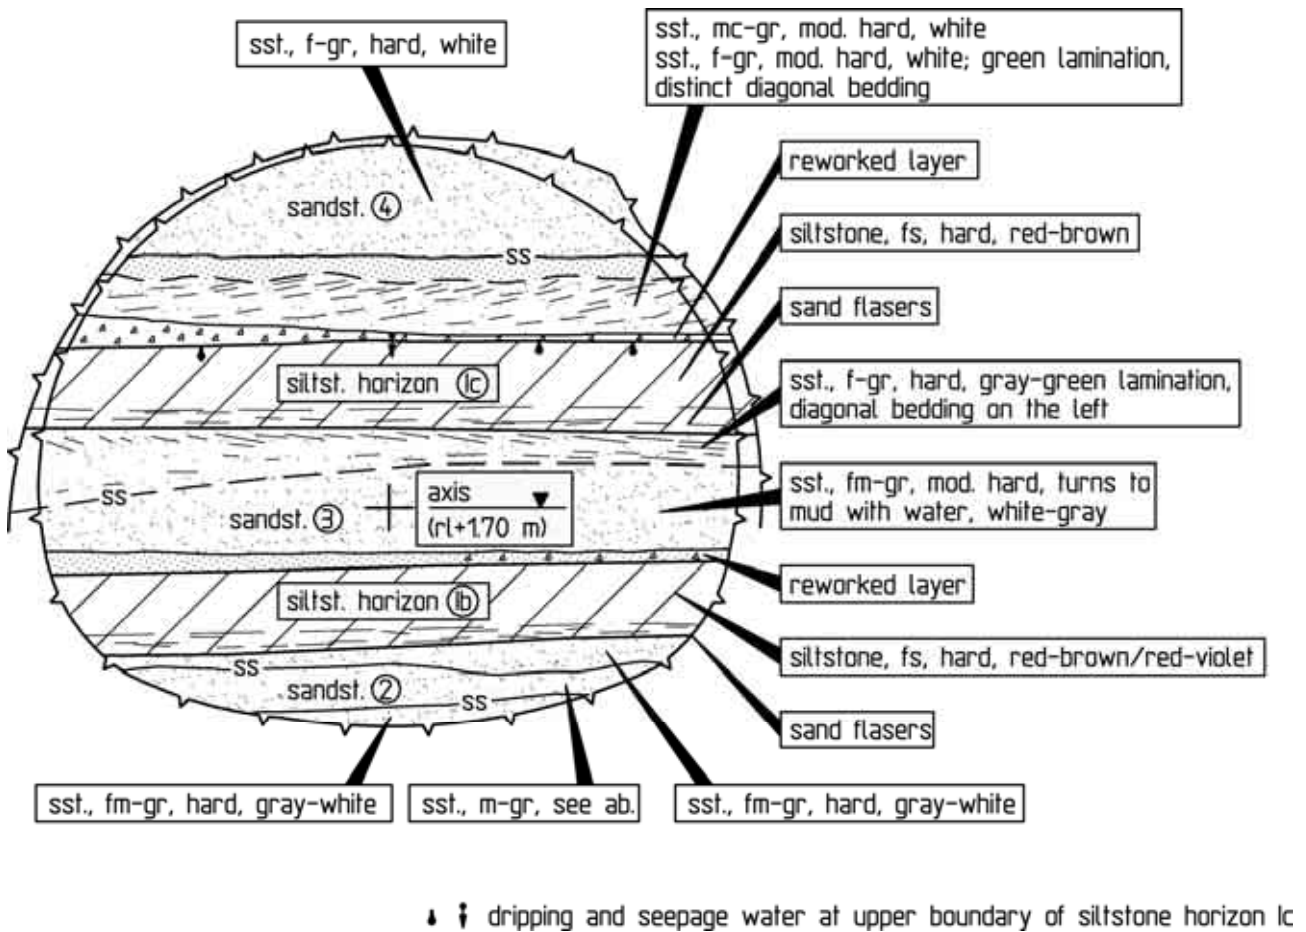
Detail mapping of a tunnel face (Hasenberg Tunnel, Stuttgart urban railway)
